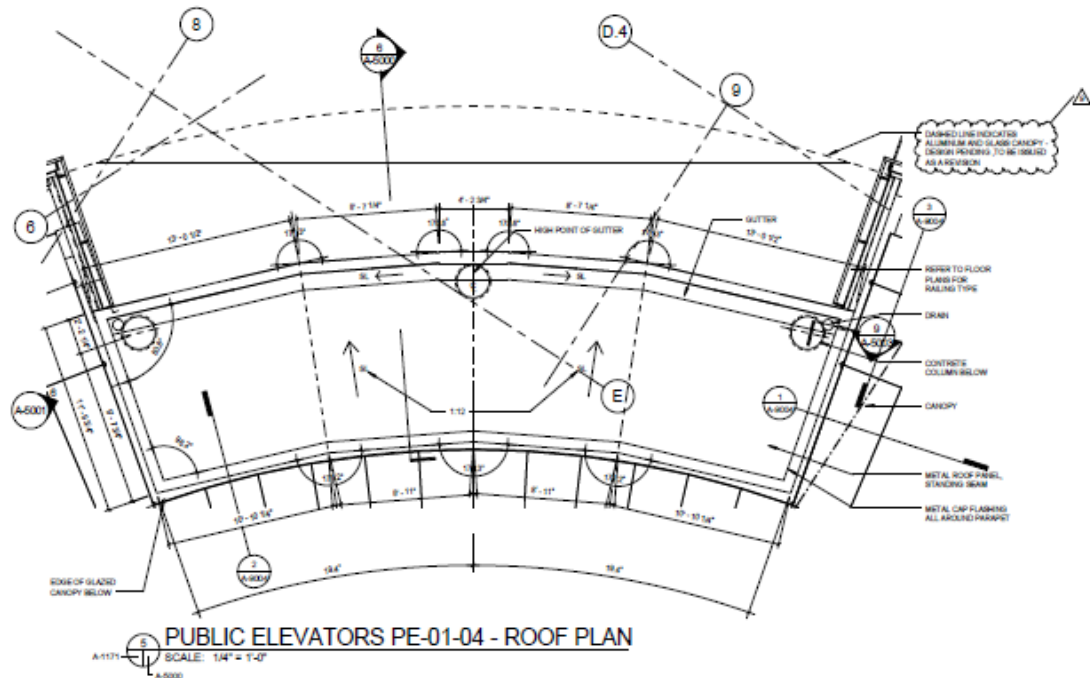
Roof Plan of the Elevator System of Case Study 1
